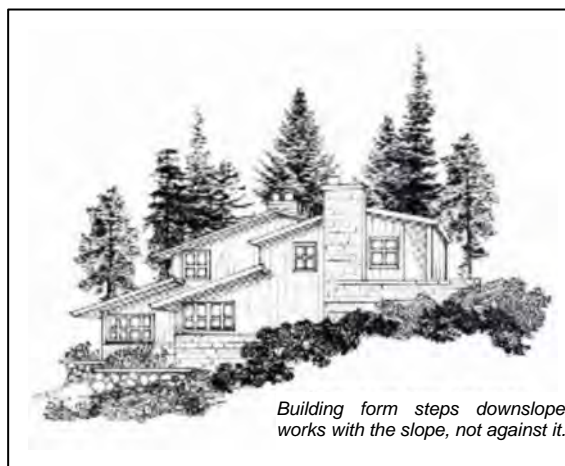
Design Sensitive to Terrain (an example of building form, not intended to show preferred architectural style)
